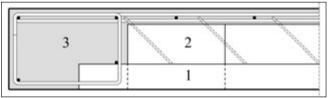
Configuration of the end of the floor specimen (1 – prefabricated Porotherm beam; 2 – Porotherm 60/17 clay block; 3 – monolithic reinforced concrete cornice)
